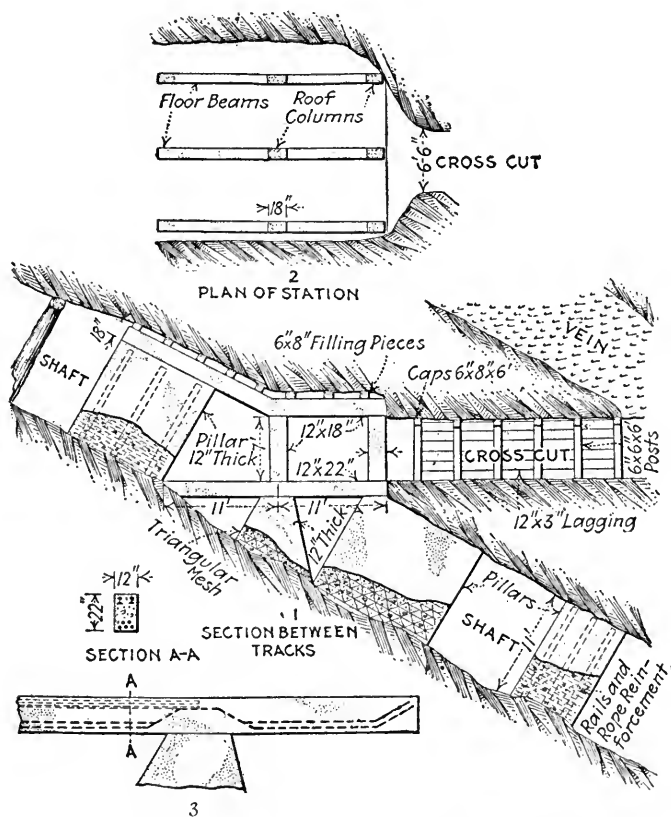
CONCRETE SUPPORTS FOR A STATION IN HEAVY GROUND.
